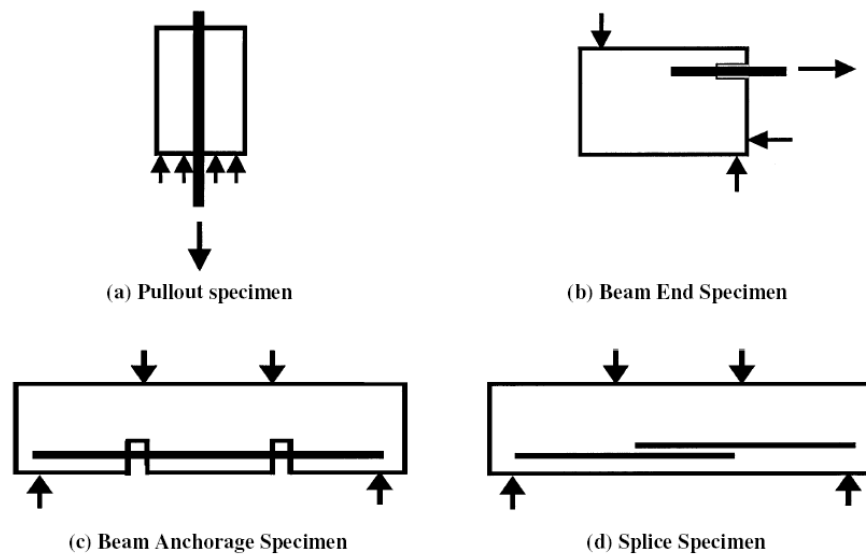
Schematic of bond test; a: pull-out test, b, c, d: beam tests.
